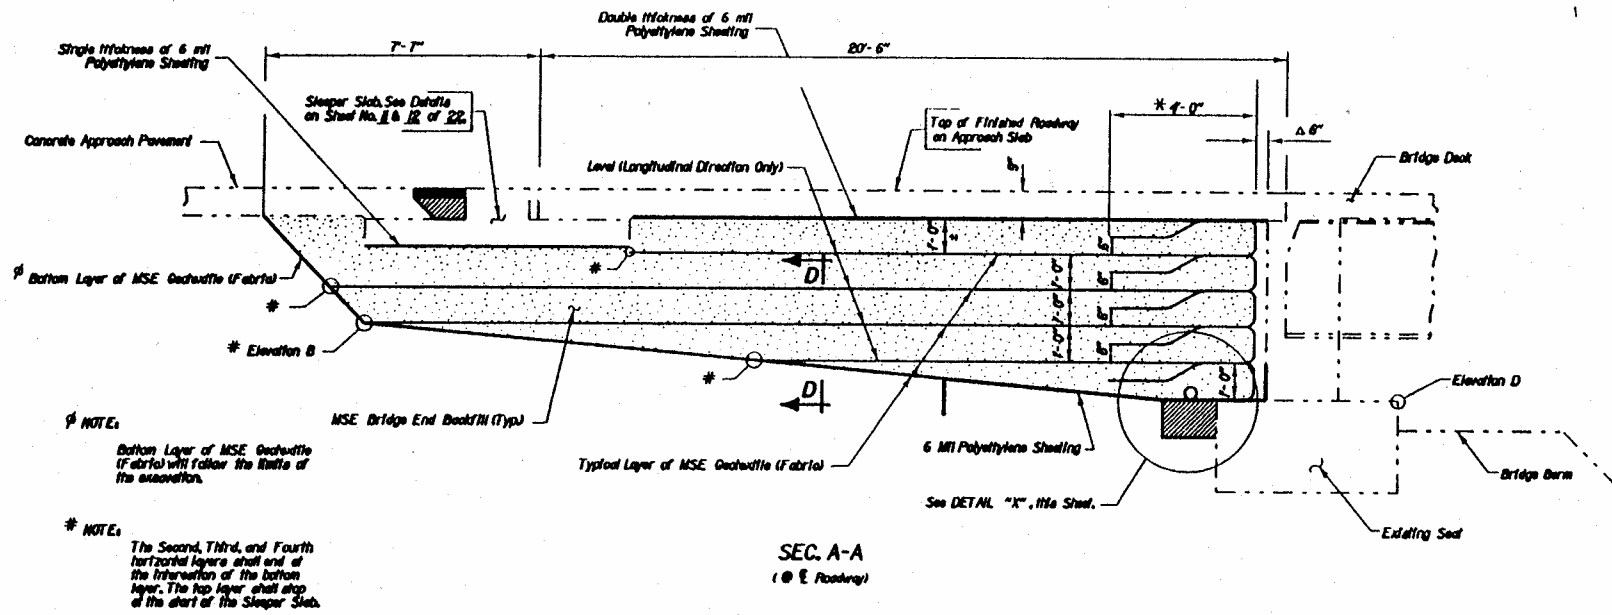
Design detail prior to 1999 of a typical geotextile reinforced soil wall behind the integral abutment
